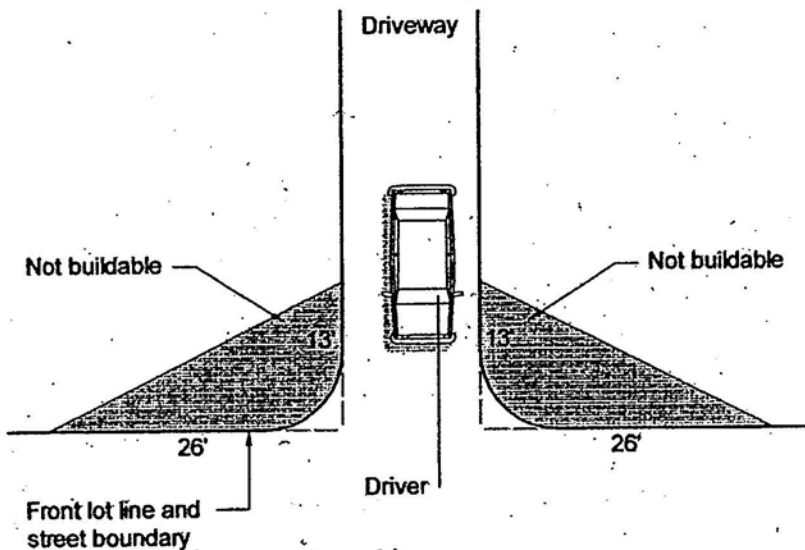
Visibility at Driveways on Public and Private Streets
